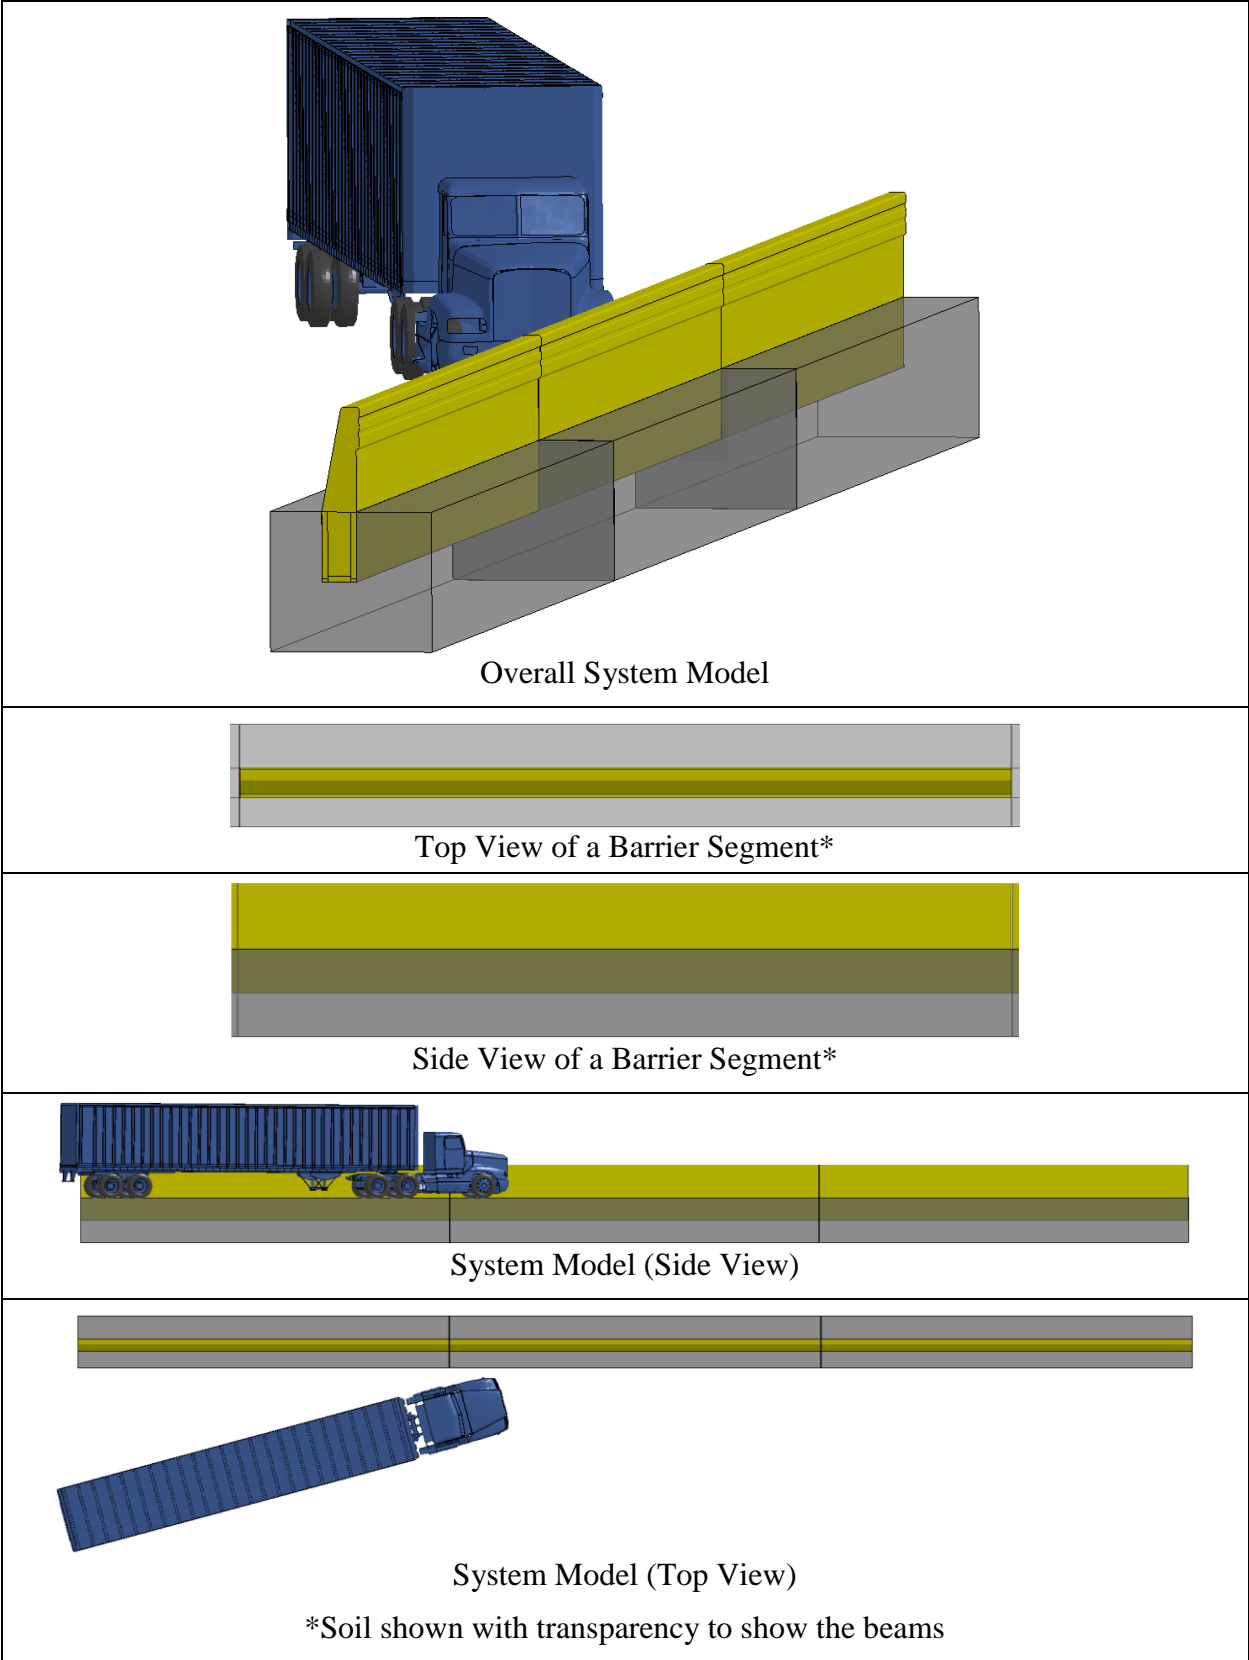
Optimized Concrete Beam Foundation Simulation Model Details
